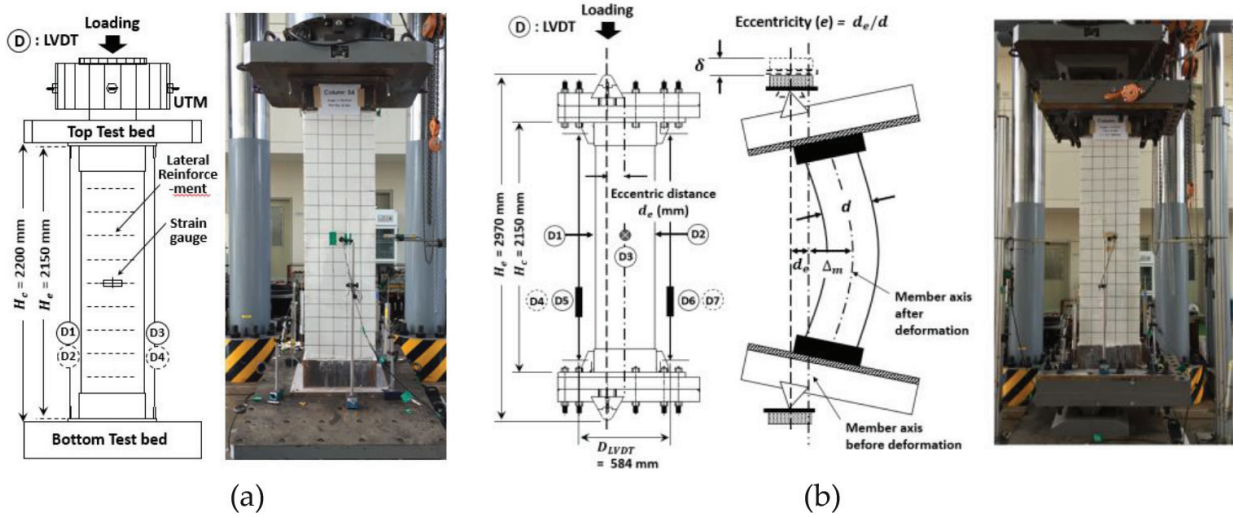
Test setup of compressive loading tests: (a) concentric axial loading and (b) eccentric axial loading.
